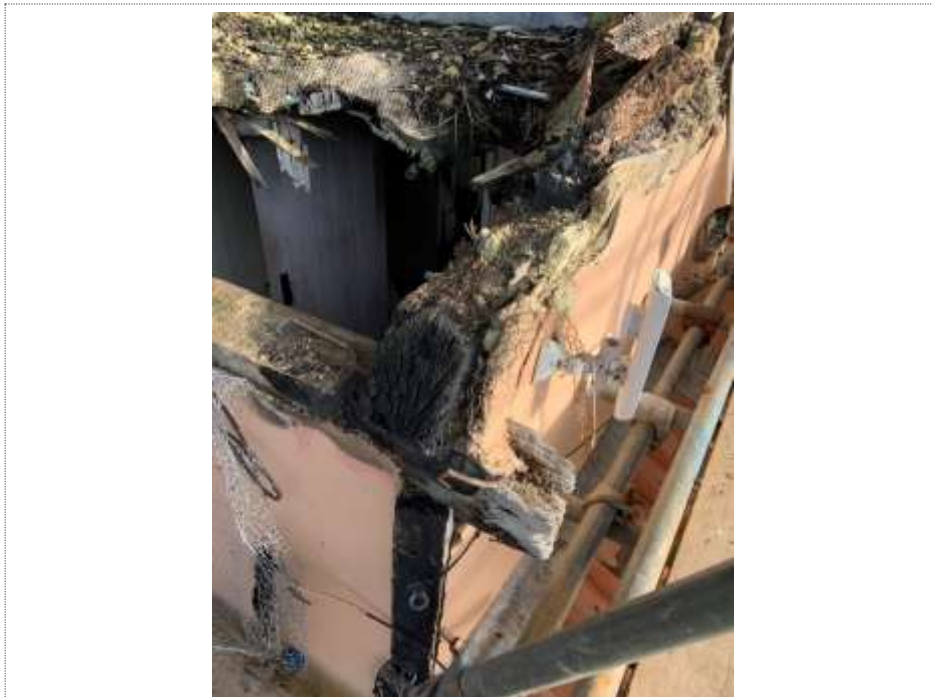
Wall plates overlapping and extending over the edge of the wall.
